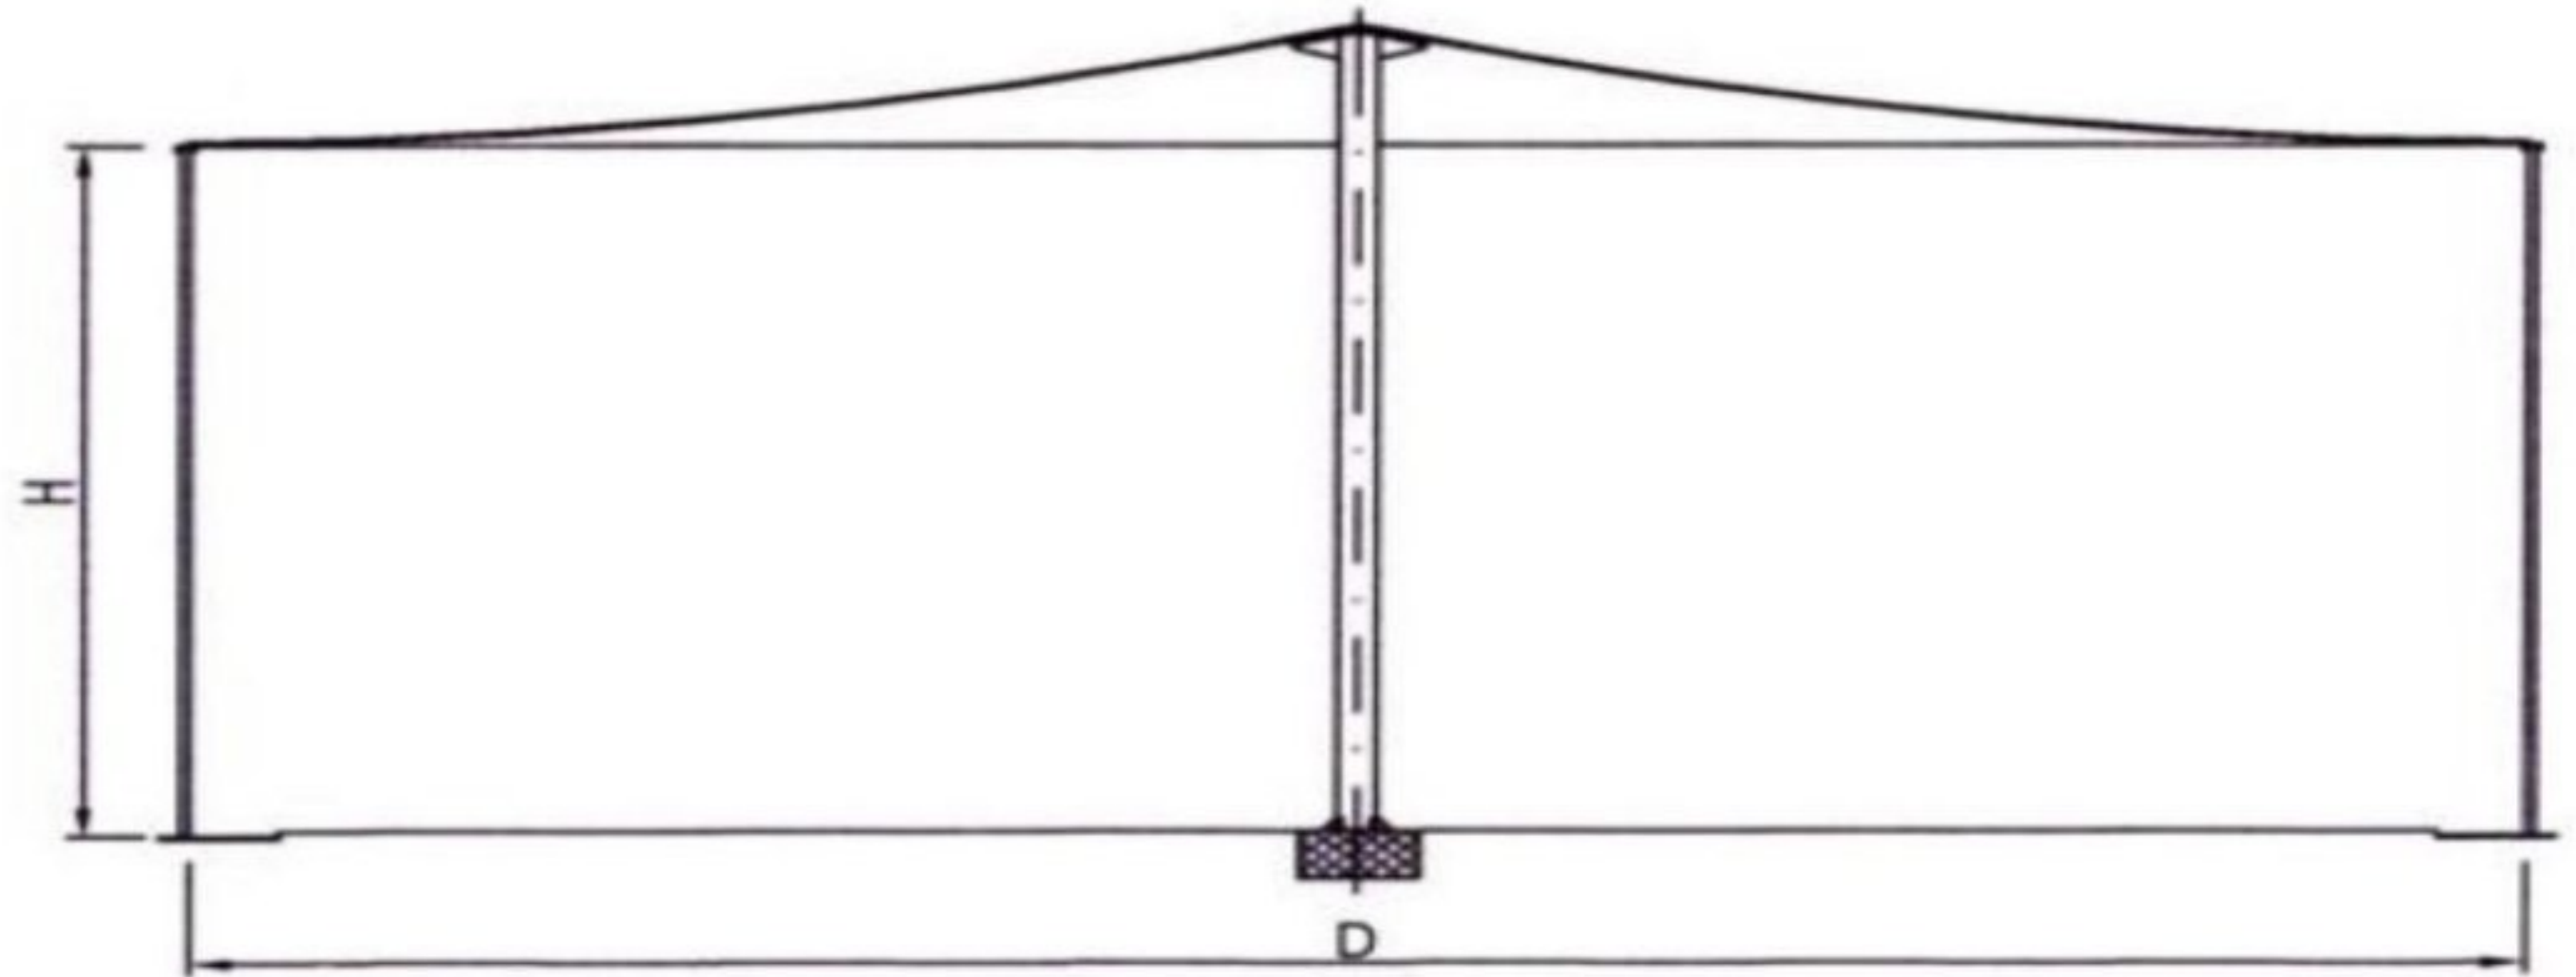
Vertical cylindrical tanks with central column and triangular ceilings
